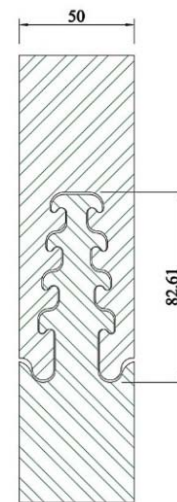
Plan view of steel plate connection geometry investigated (units in mm).
